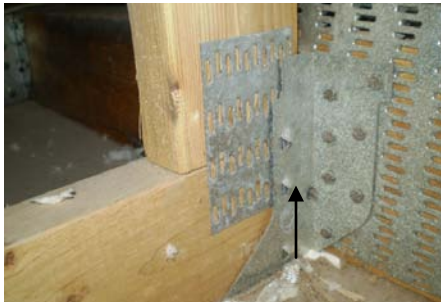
HARDWARE NOT NAILED AT MANY LOCATIONS IN ATTIC
